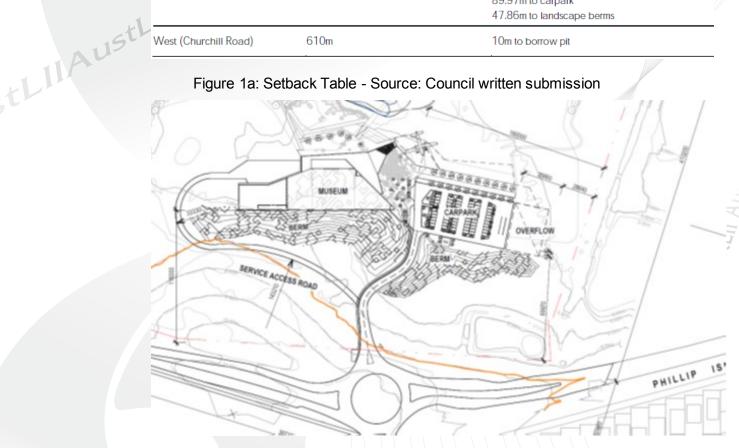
Extract of the Proposed Site Context Plan – Source: Council written submission
